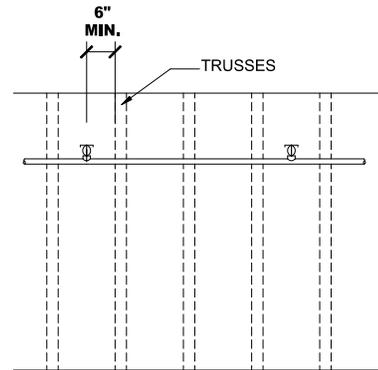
MINIMUM REQUIRED LATERAL DIMENSION FROM FACE OF CHORDS AND WEB MEMBERS FOR FL-SA/BB, GAP AND DS SPRINKLERS
